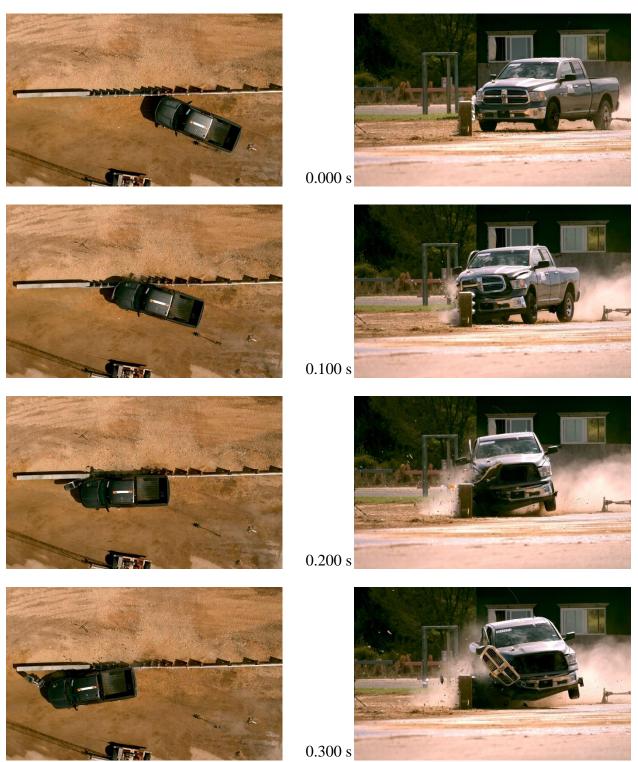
Sequential Photographs for Test No. 469549-01-2 (Overhead and Frontal Views).
